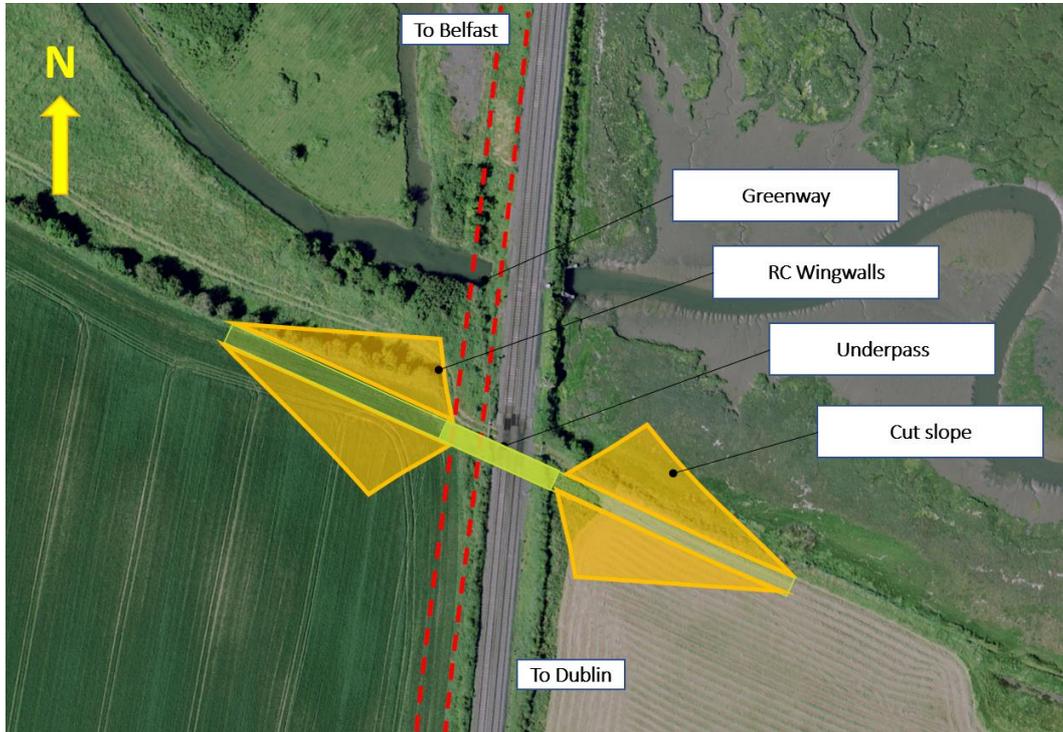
Level crossing option 6 underpass layout sketch (Source: OSI aerial mapping)
